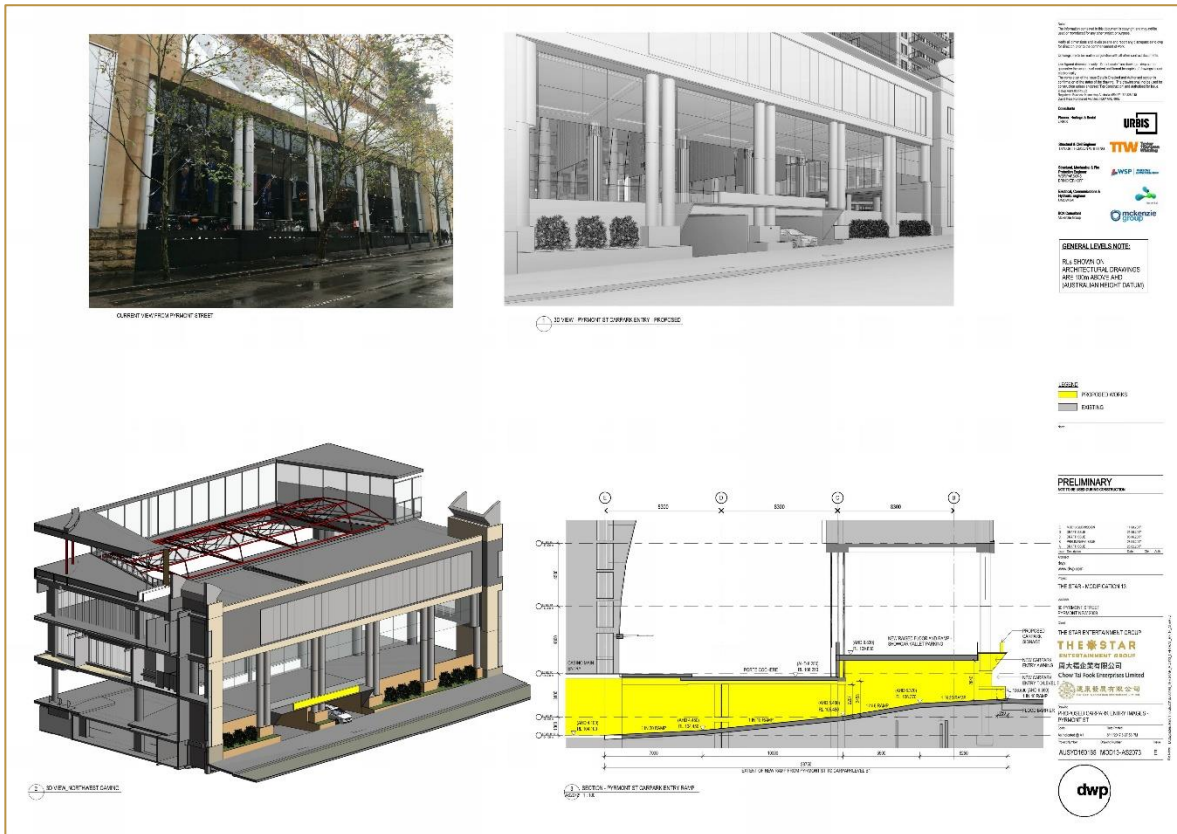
PROPOSED NEW PYRMONT ROAD CAR PARK ENTRANCE
